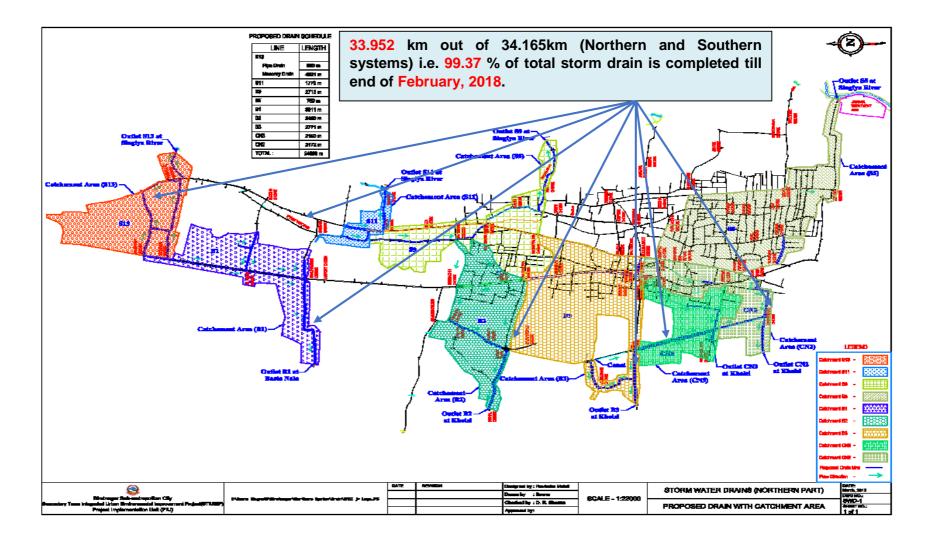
PROPOSED STORM WATER DRAINS IN BMC (Northern Drainage System)
